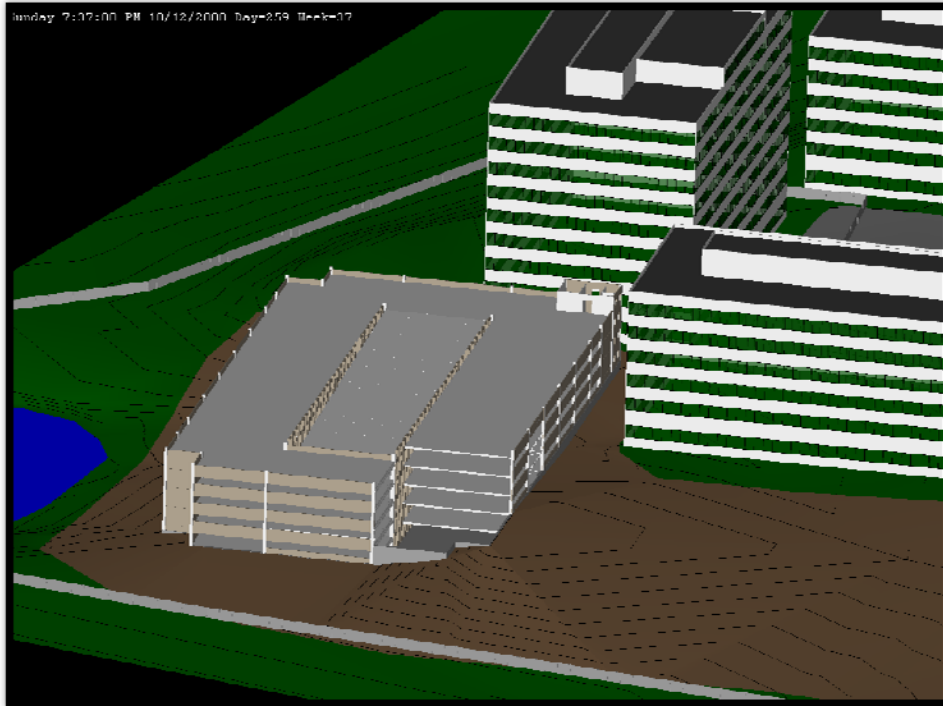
Foundation Complete, Backfill Complete, Waiting on Crane
